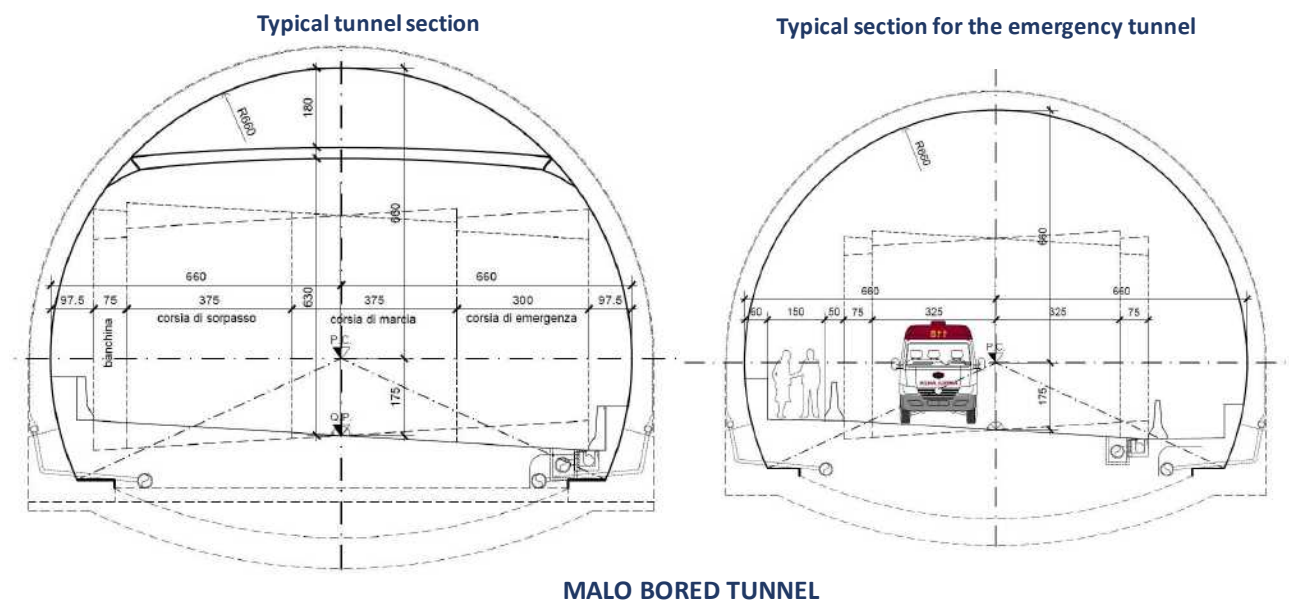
Cross-sections through Malo tunnel and emergency tunnel. Source: SPV
